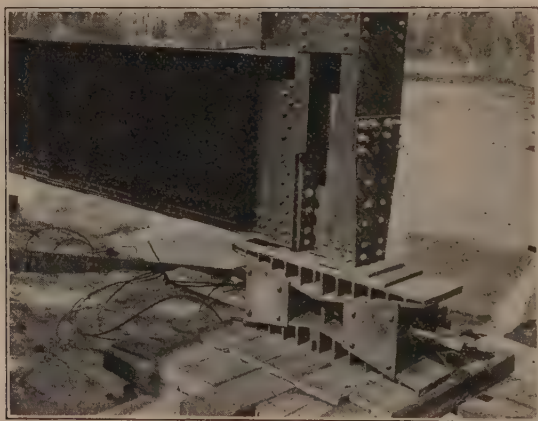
ADJUSTABLE STEEL WEDGE JACKS
